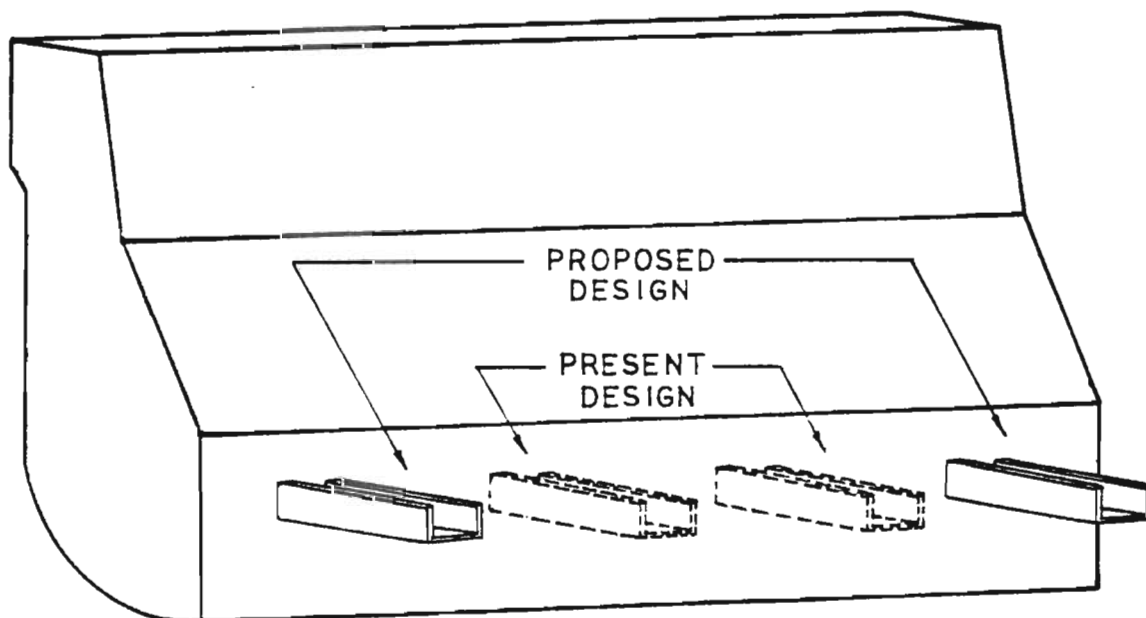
Proposed change in spacing of connection channels would facilitate adjustment and leveling of the parapet units
